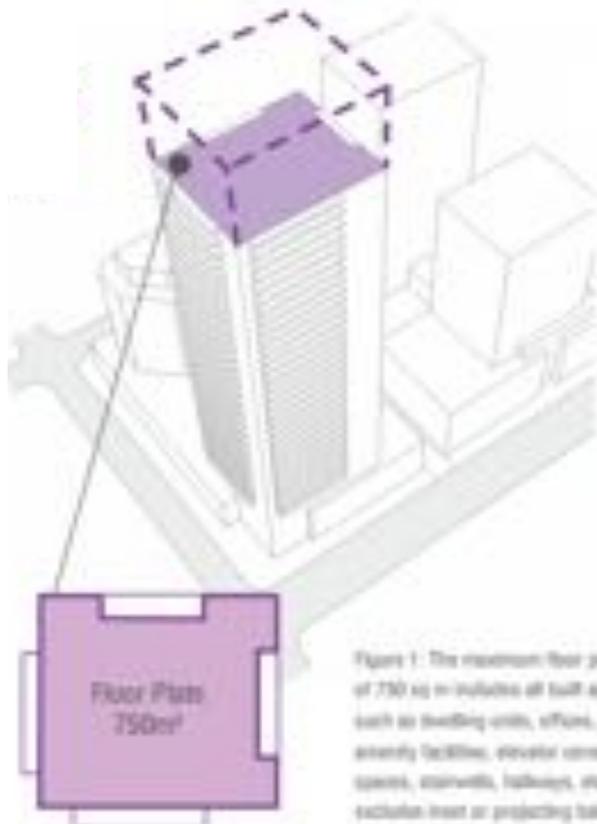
The maximum floor plate size of 750 sq m includes all built area, such as building units, offices, retail, amenity facilities, elevator cores, storage spaces, stairwells, hallways, etc., but excludes terraces or projecting balconies.
